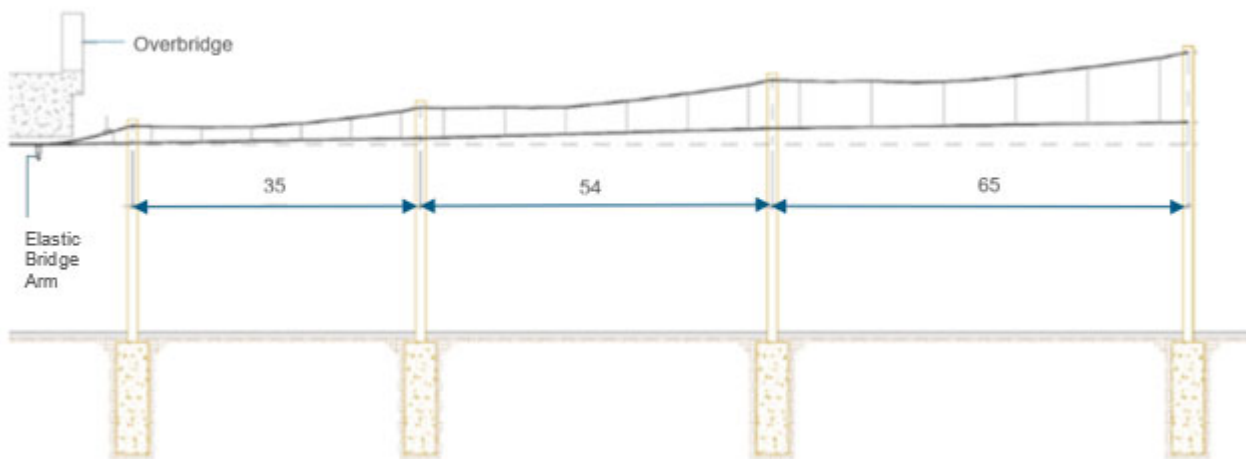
Typical Arrangement on Approach to a Low Bridge
